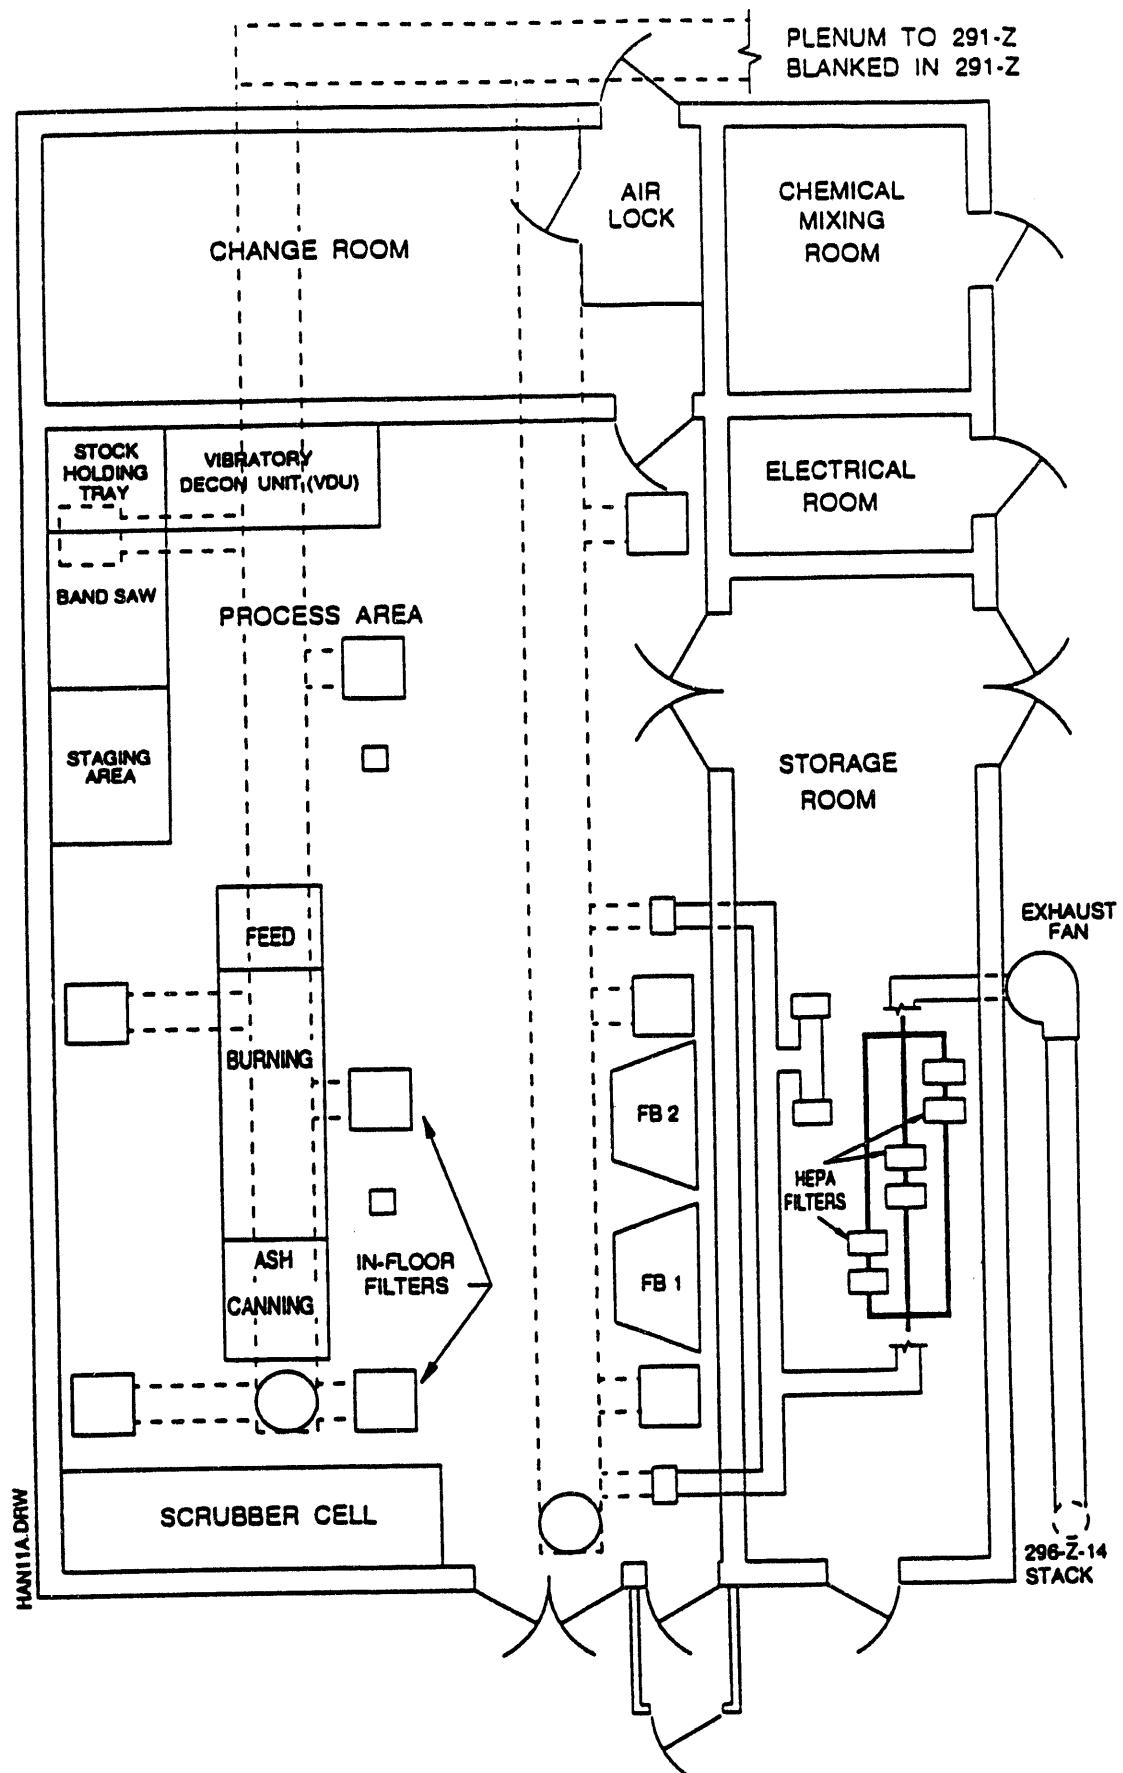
BUILDING 232-Z SEGMENTING AND DECONTAMINATION EQUIPMENT LAYOUT
